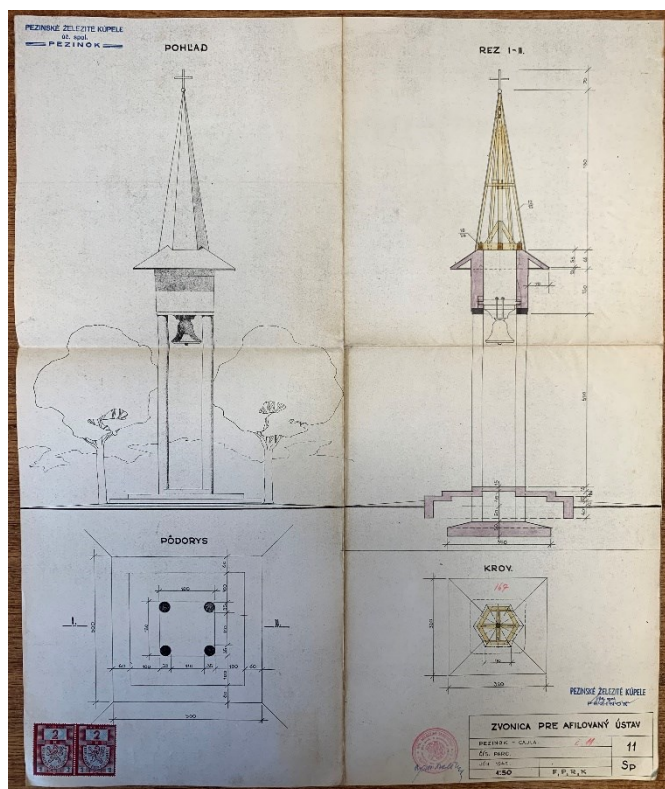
The Pezinok Institute for People with Nervous and Mental Health Disorders. The Bell Tower. Elevation, cross-section, and plan. (Source: State Archives in Bratislava, Slovakia, 1942)
